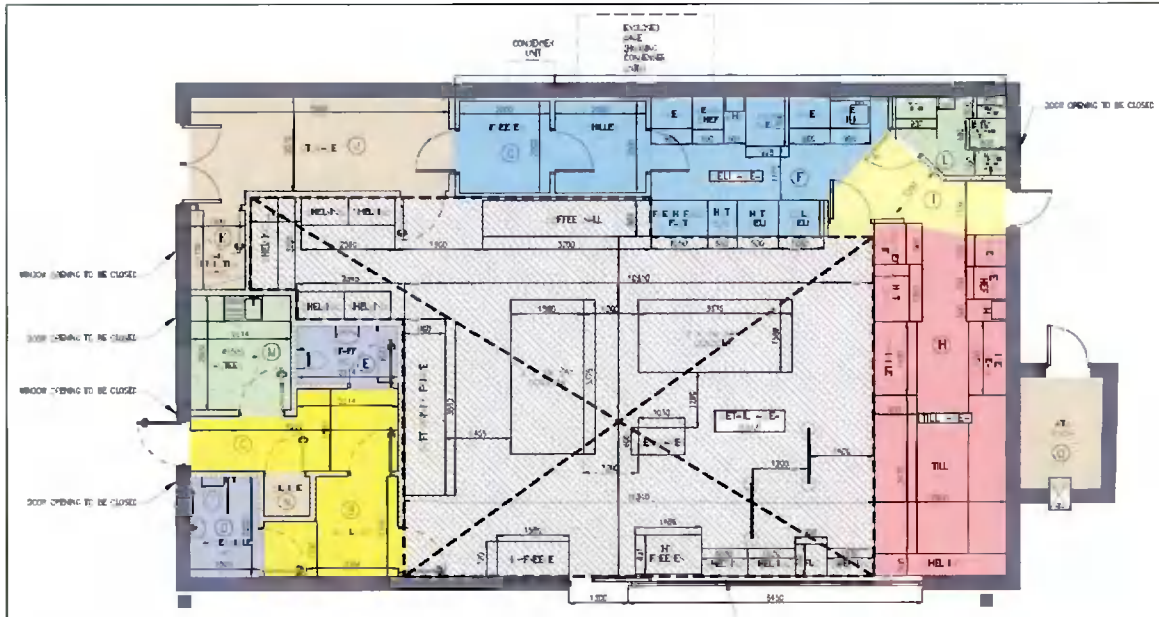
Proposed floor plan (Source: McArdle Doyle, 2022).
